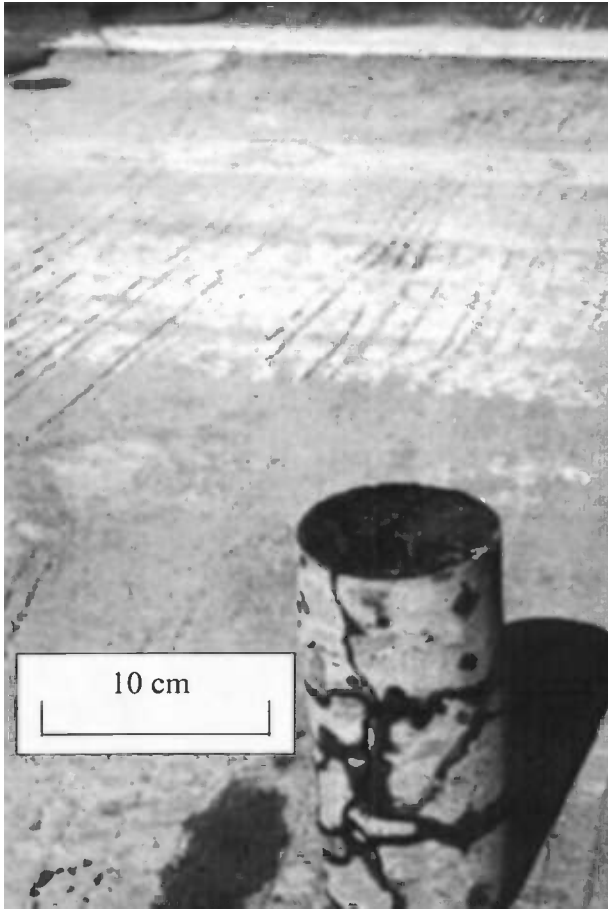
Vertical concrete core from jointed pavement in which major cracking due to ASR developed primarily in a diagonal orientation. Lesser cracking is evident vertically and diagonally. The horizontal cracking developed normal to the general direction of least resistance to cracking.
